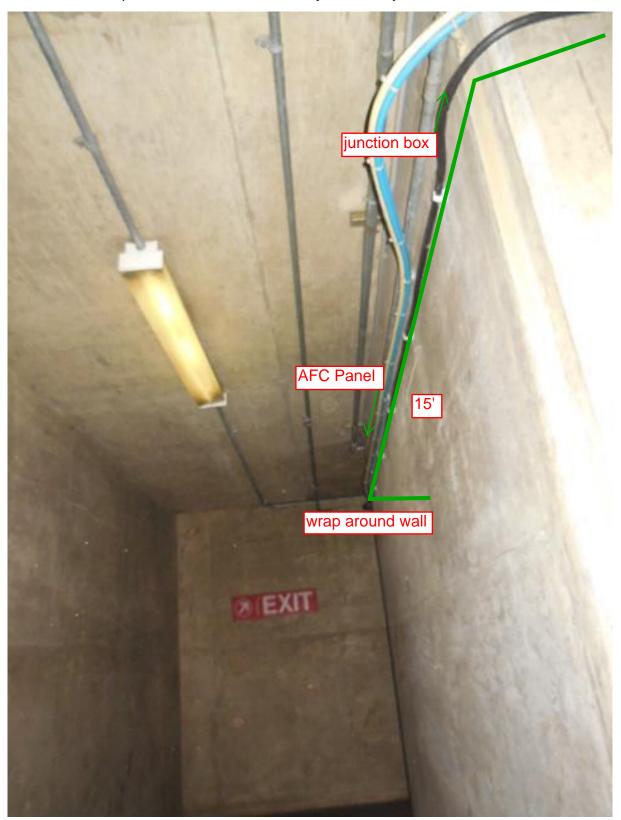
Proposed conduit run in hallway between junction box and Room C101
